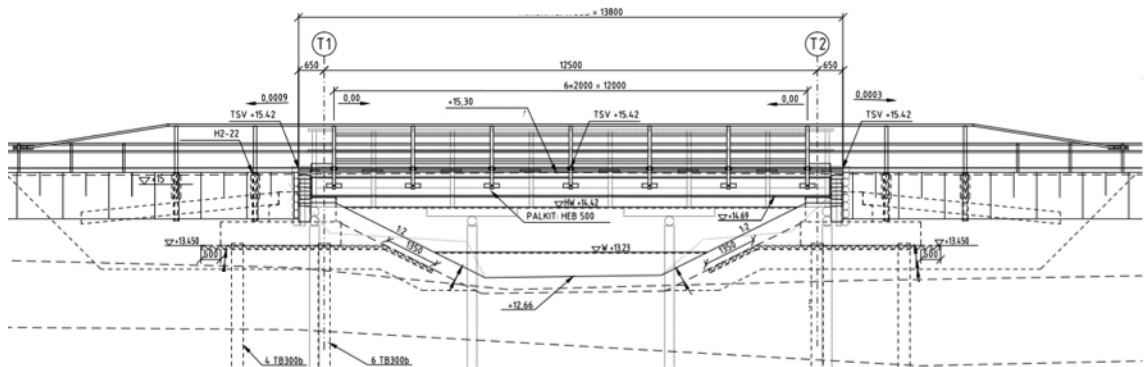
Designed bridge elevation. The old structure is shown by dotted lines
